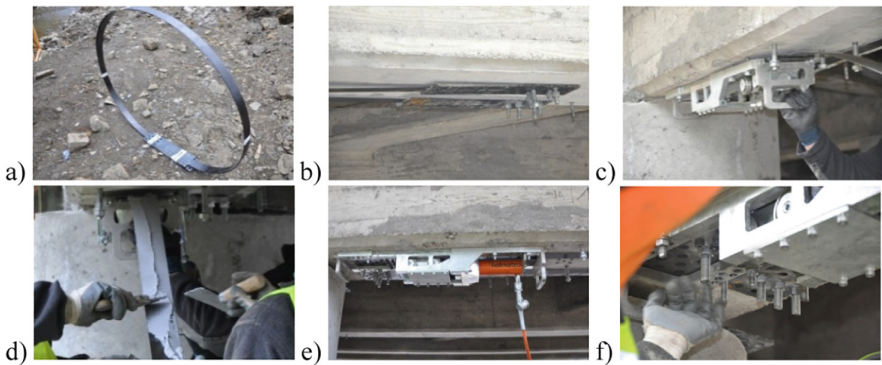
Strengthening procedure: (a) strips with anchorages delivered in coils, (b) passive anchorage installation, (c) tensioning device installation, (d) epoxy adhesive application, (e) strip tensioning, (f) active anchorage installation
